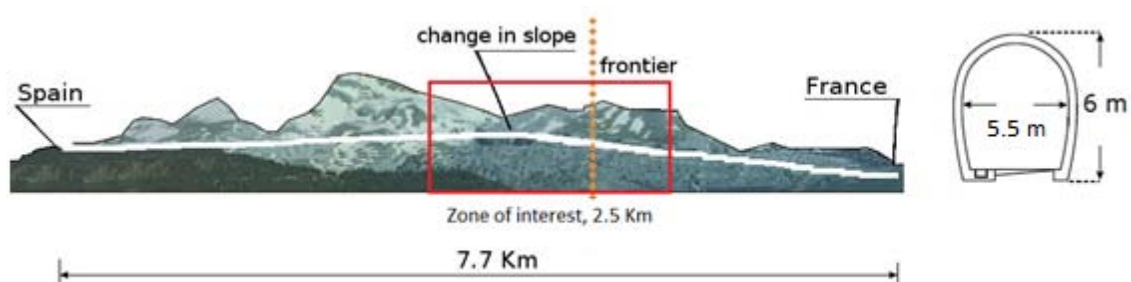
Longitudinal and Cross section of the Somport Tunnel
